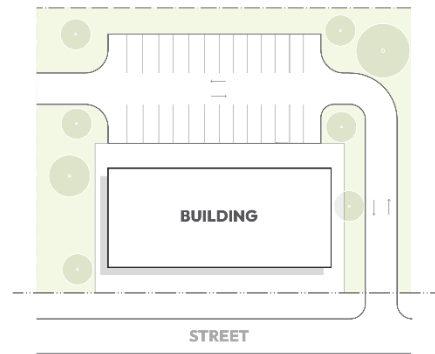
Permitted Parking Area Location - Between Building and Rear Lot Line
